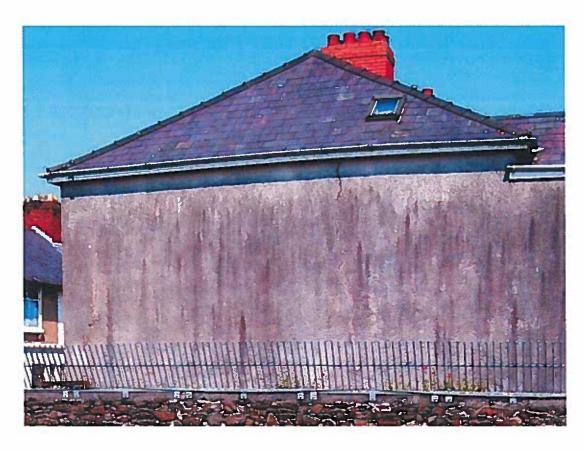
Subsidence crack in the wall of a property, immediately east of Area I
